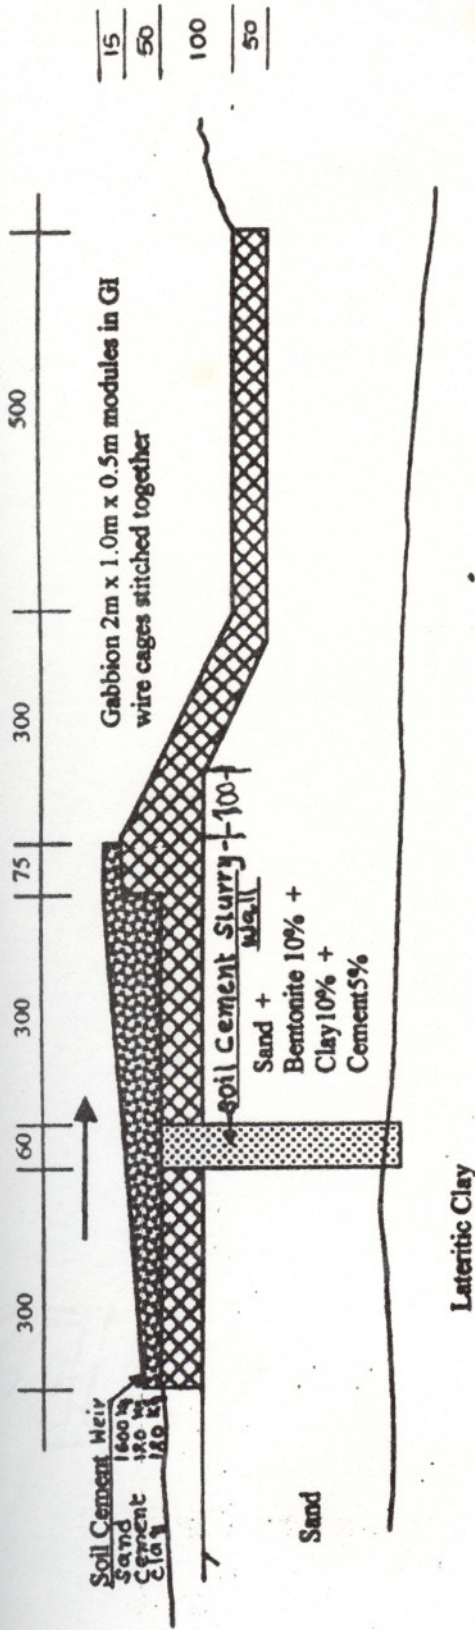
Construction of check dam across Bharathapuzha at Thrangali Kadavu in Vaniyamkulam Panachayath, site plan.
